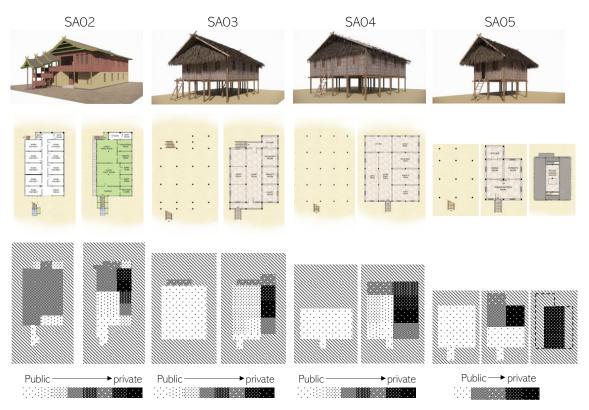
SA's houses in Kampung Tengah with 3D render, floor plan and layout analysis
